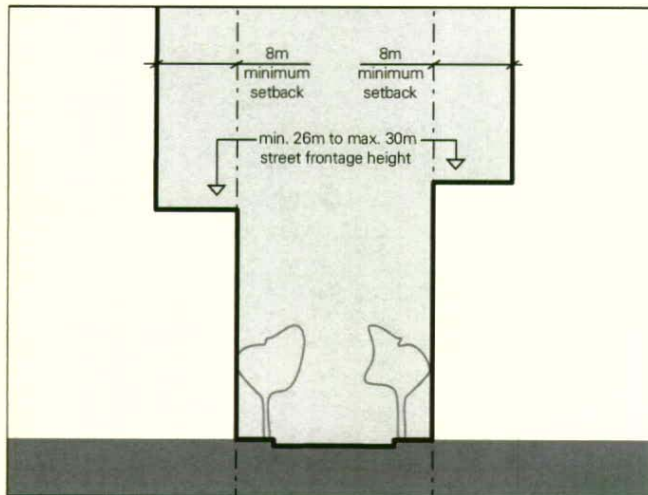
Street Frontage Height Type D. Above street frontage heights, buildings are to be set back a minimum of 8 metres
